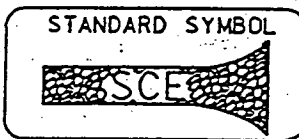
STABILIZED CONSTRUCTION ENTRANCE
